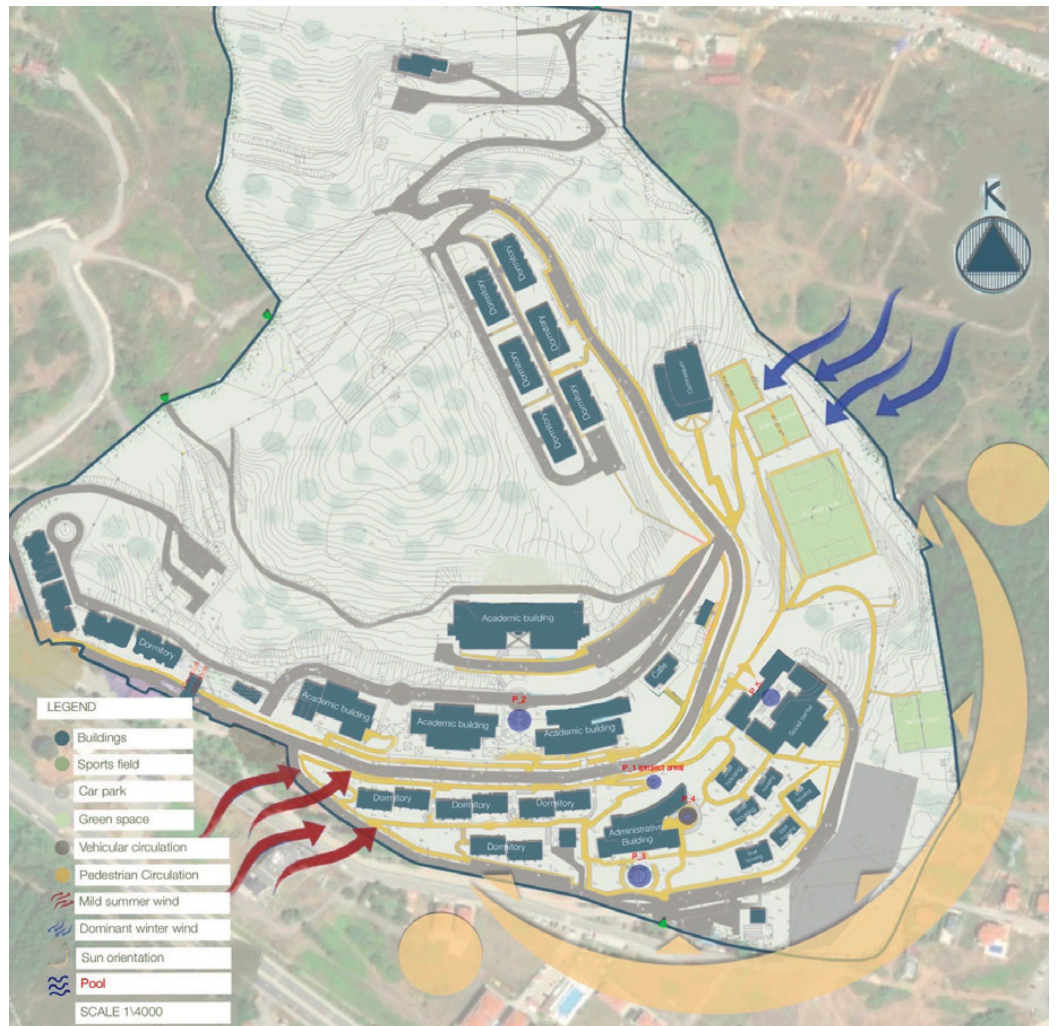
| Campus Site Plan (credit: S. Sevinç, 2022).
